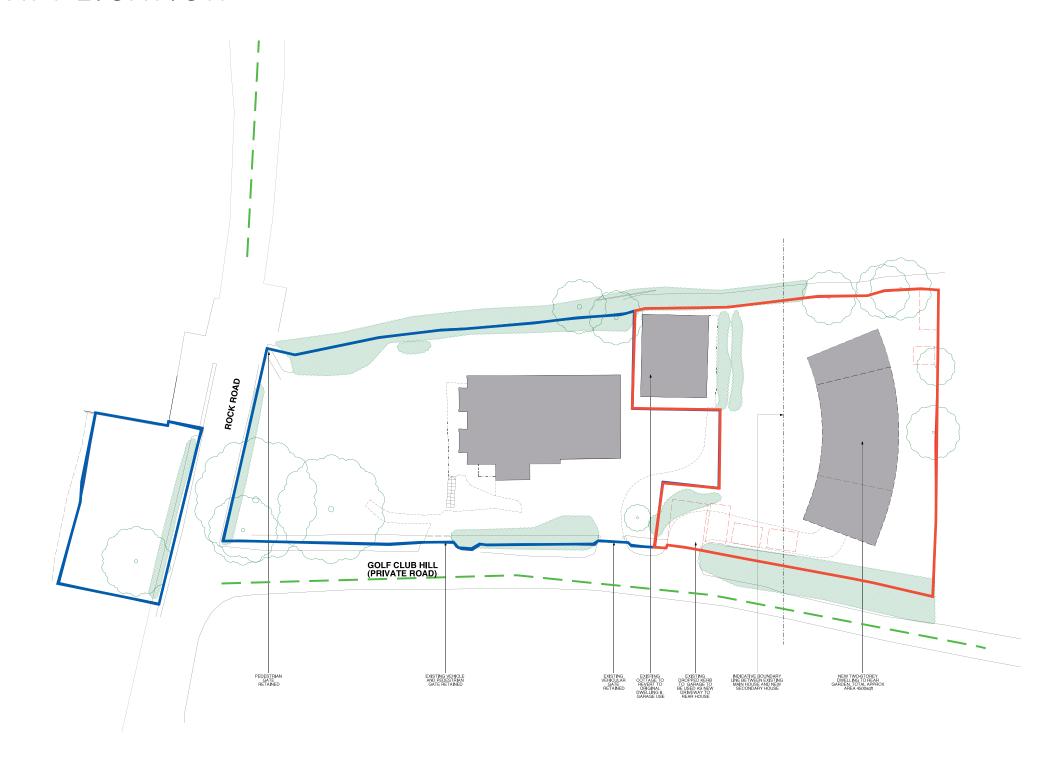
CONSENTED SITE PLAN (DWG NO. 1472\_106)
